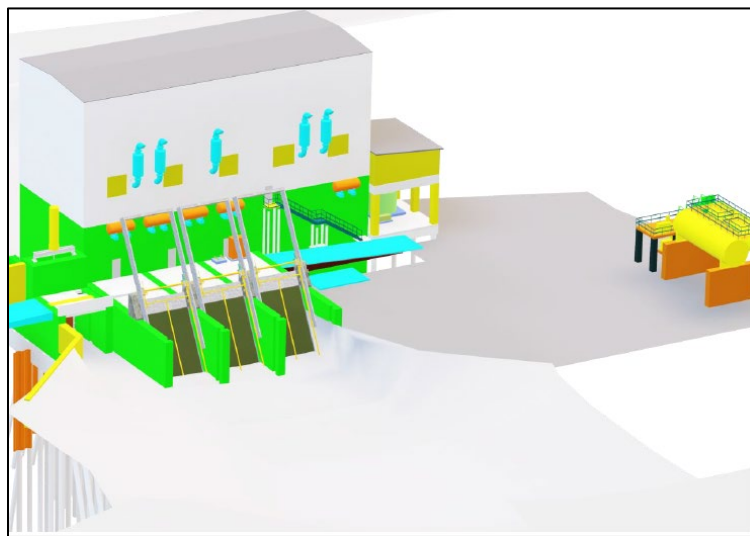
Typical Site Plan of a Pump Station with Small Pumping Capacity
